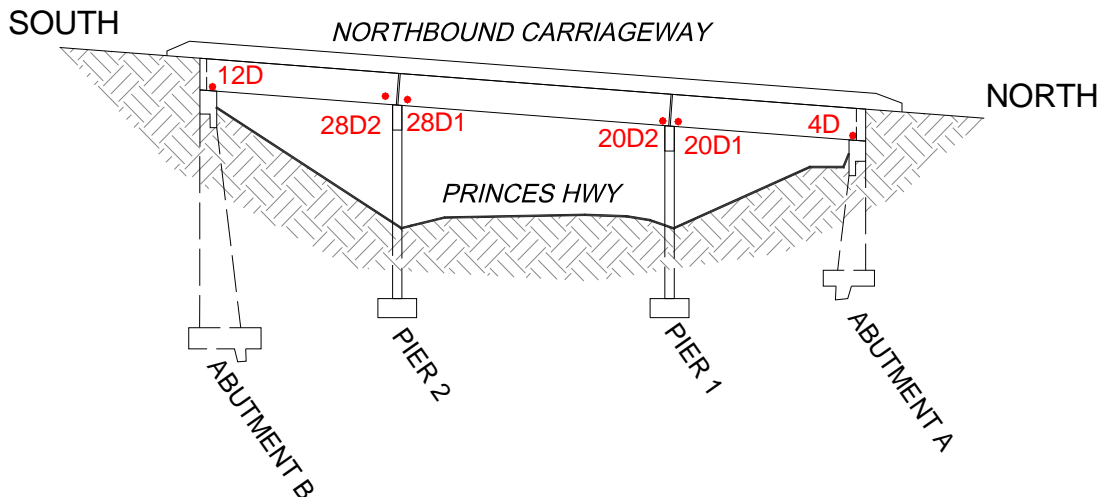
Bridge 2 - Deck Girders – Elevation 2 – Relative 3D Monitoring Locations
